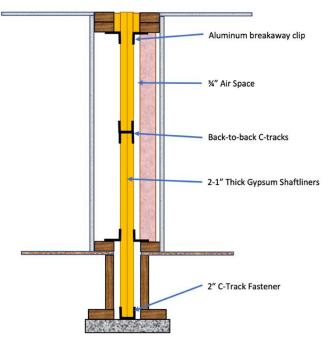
Cross-Section of a Gypsum Shaftliner Assembly
